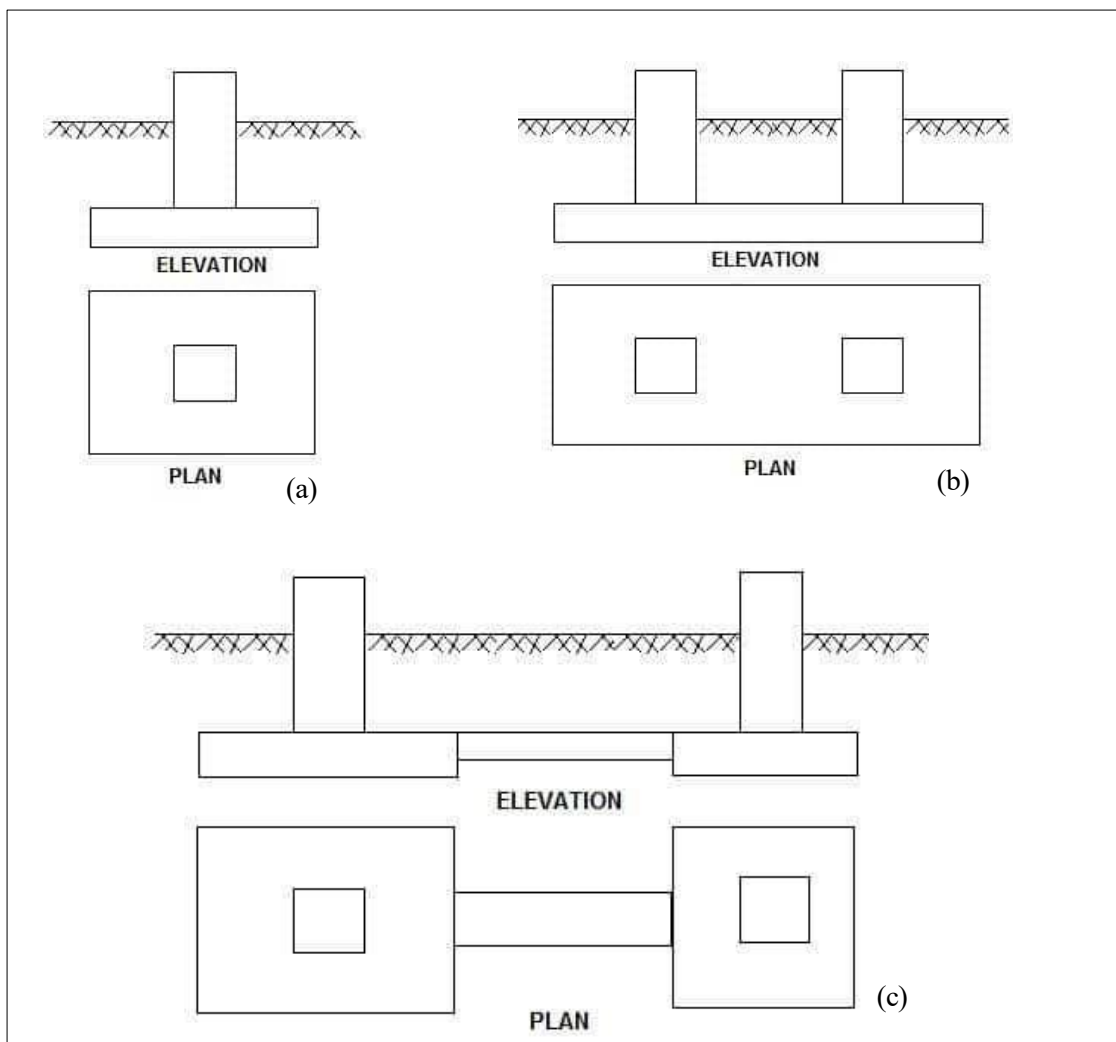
Shallow foundation, (a) Individual foundation, (b) Combined foundation, (c) Strip foundation ¹⁹
